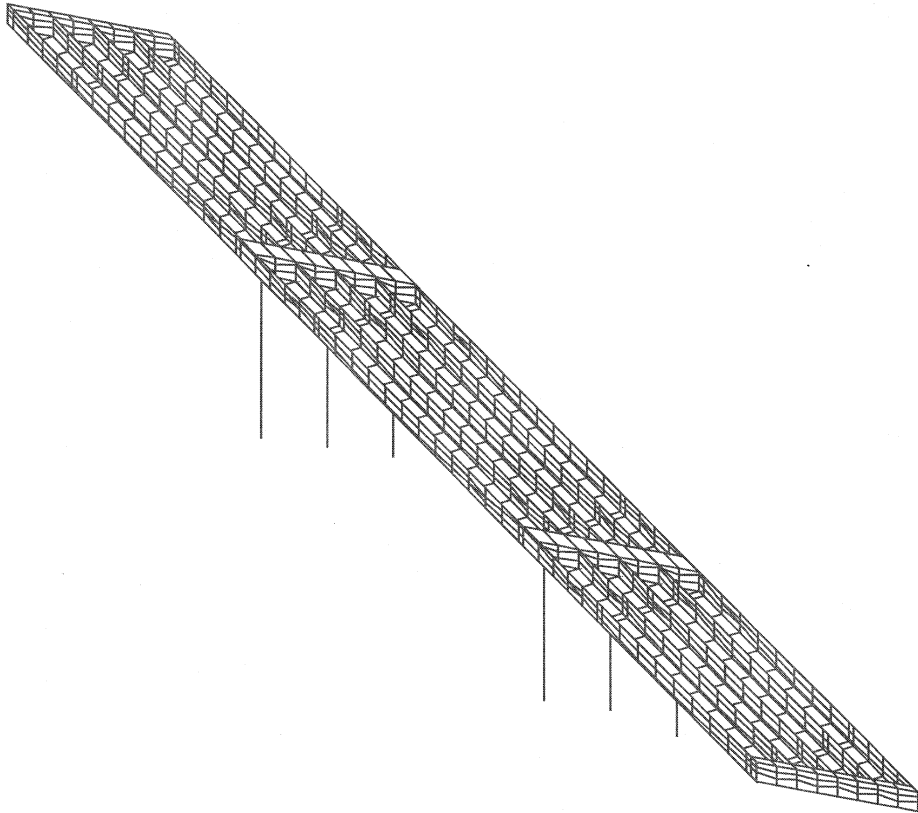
Concrete box-girder modeling example (deck elements not shown).
